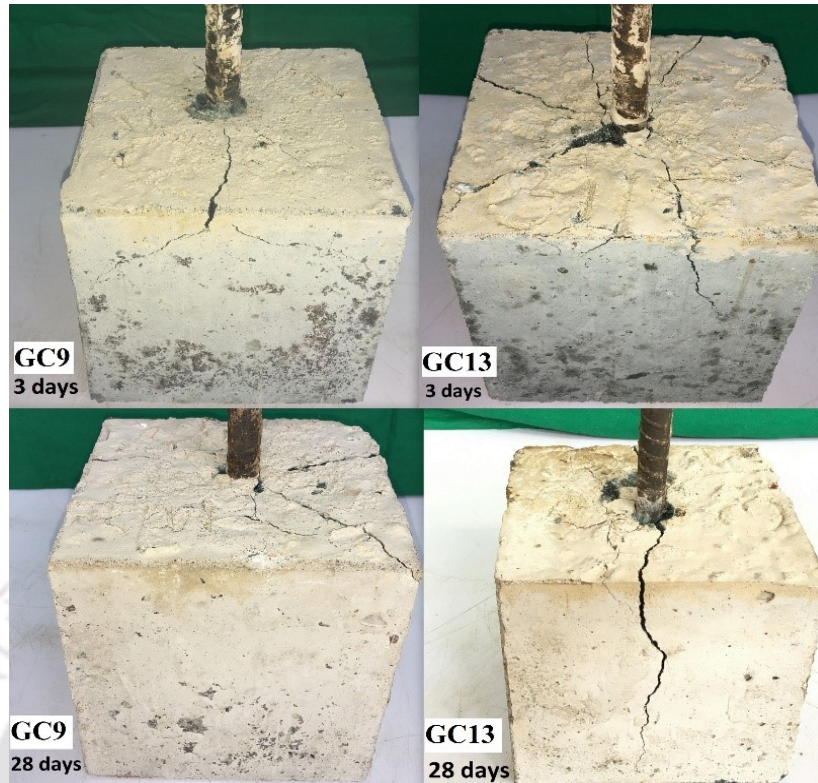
Pull-out test specimens with visible cracks after failure.
